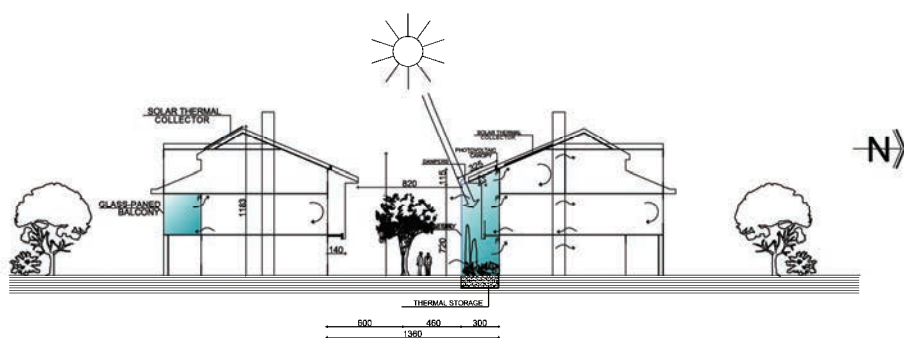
The cross-section of houses with glass-paned balconies, attached conservatories and installed solar thermal collectors in the roof
